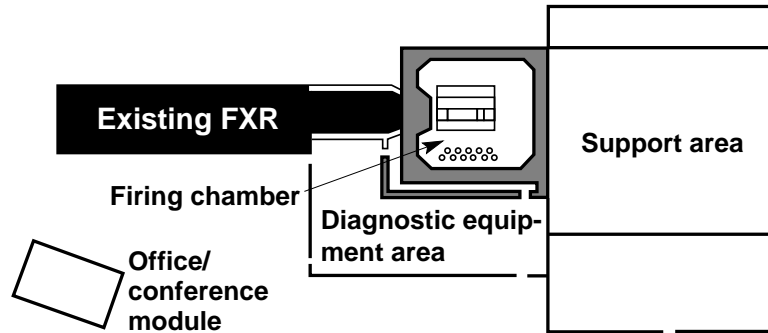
Plan view of the proposed Contained Firing Facility additions to Bunker 801.
